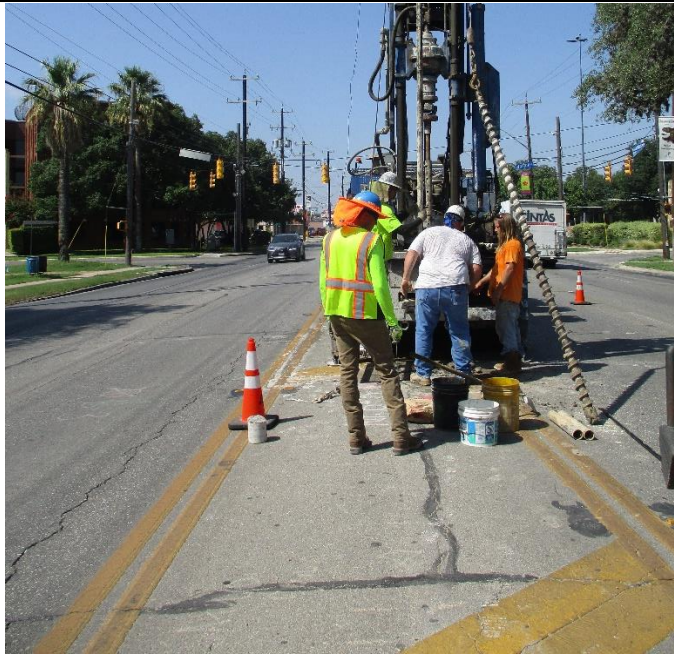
View looking towards coring/boring operations of B-3 performed at North of Broadway St and Funston Pl. Intersection.
